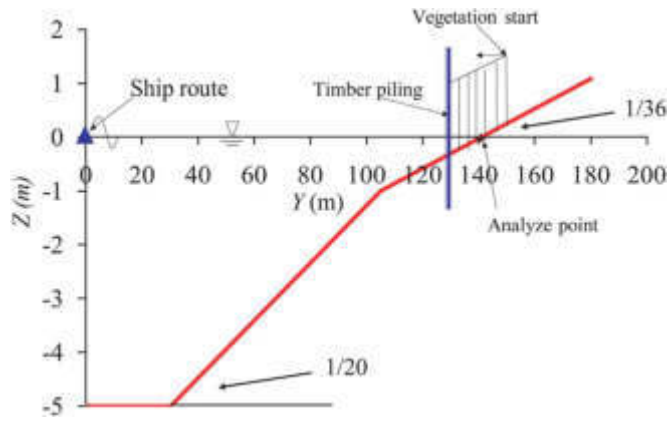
Schematic of river cross section with timber piling and vegetation at site 2, Kinh Sang River.
